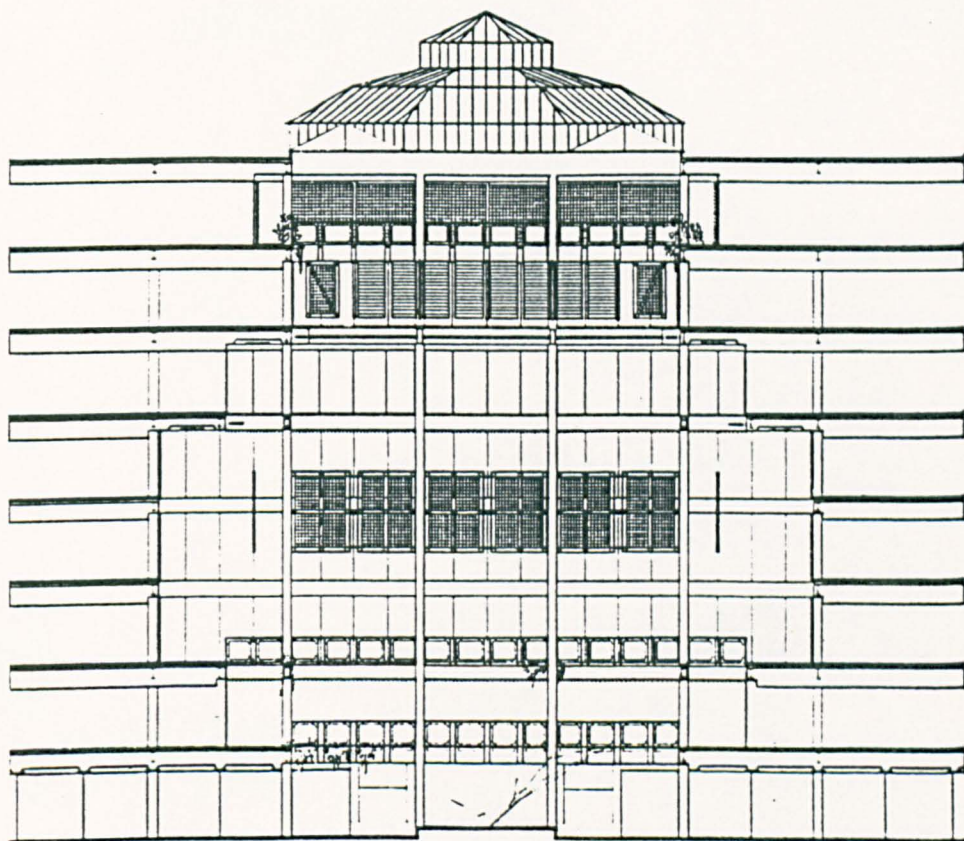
Arup Associates, Office Building, London. Constant width floors step back from the perimeter at the upper levels as they step into the atrium. The main facade of the building appears to be only five storeys, which matches the height of the neighbouring buildings.
